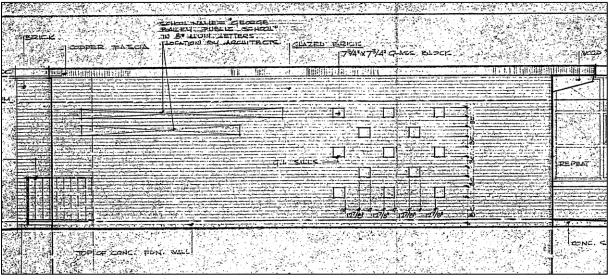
Elevation drawing of the east elevation of the 1958 addition (York Region District School Board)
